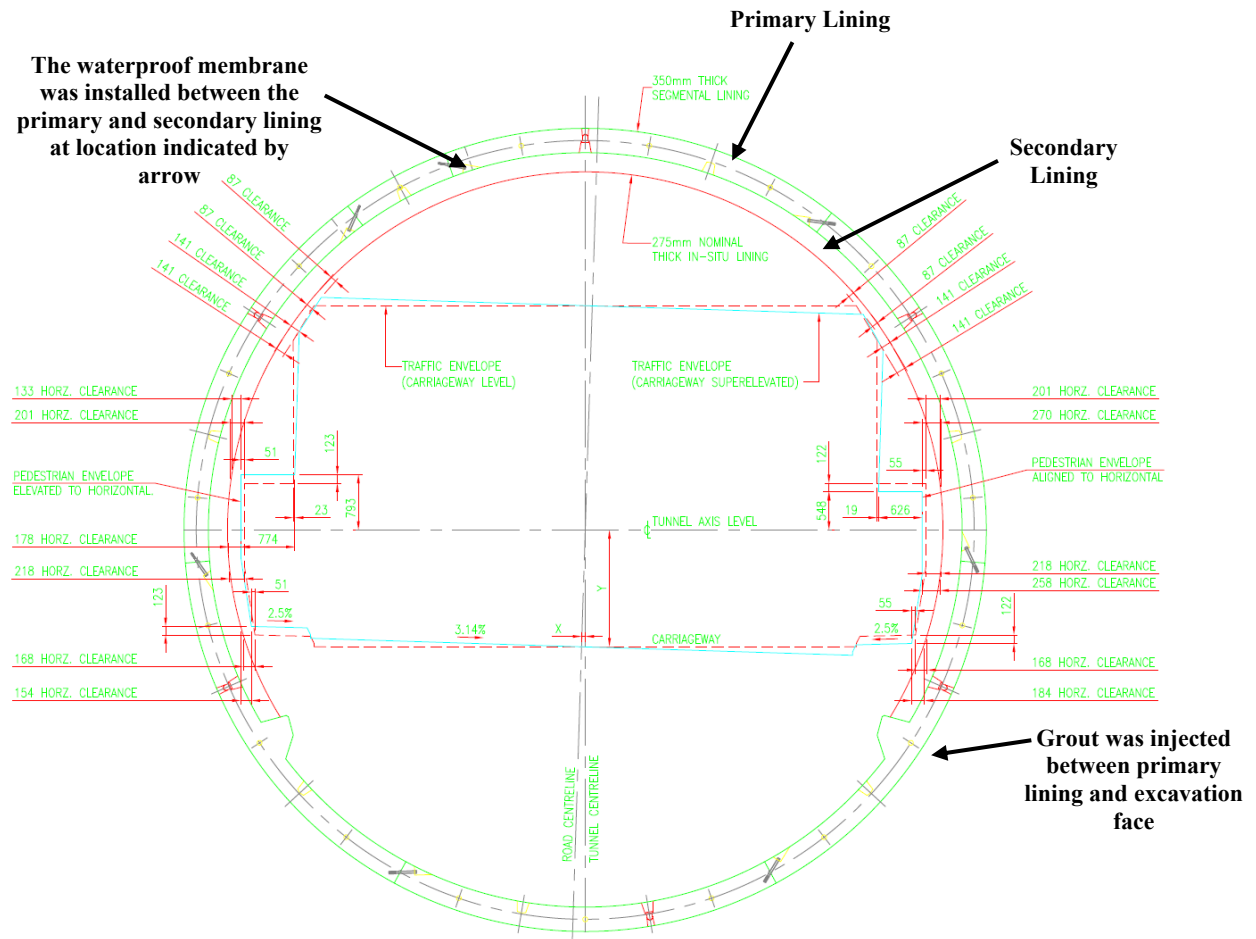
Tunnel Lining Details (extract from Dwg No. DR/HA/BT/C11/41018/07/X)
